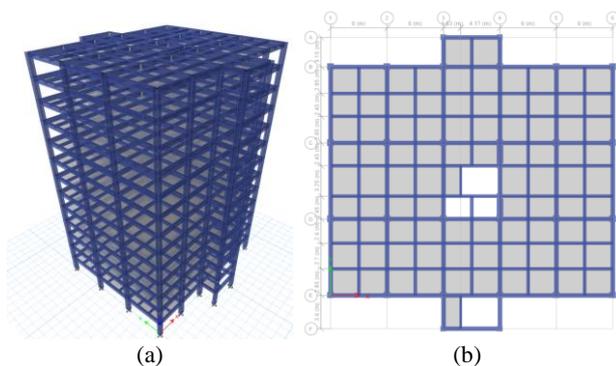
Numerical modelling of existing buildings: (a) 3D view, (b) Plan view
